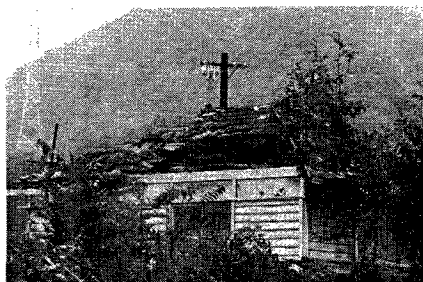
Broken tiled roof of a 2-storeyed wooden factory, Katakura, SEKI.
